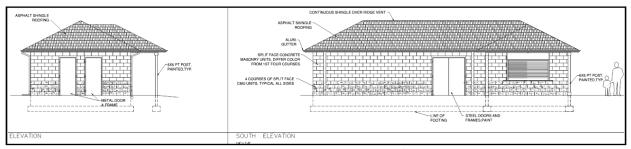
Architectural Drawing of Restroom/Concession Stand
